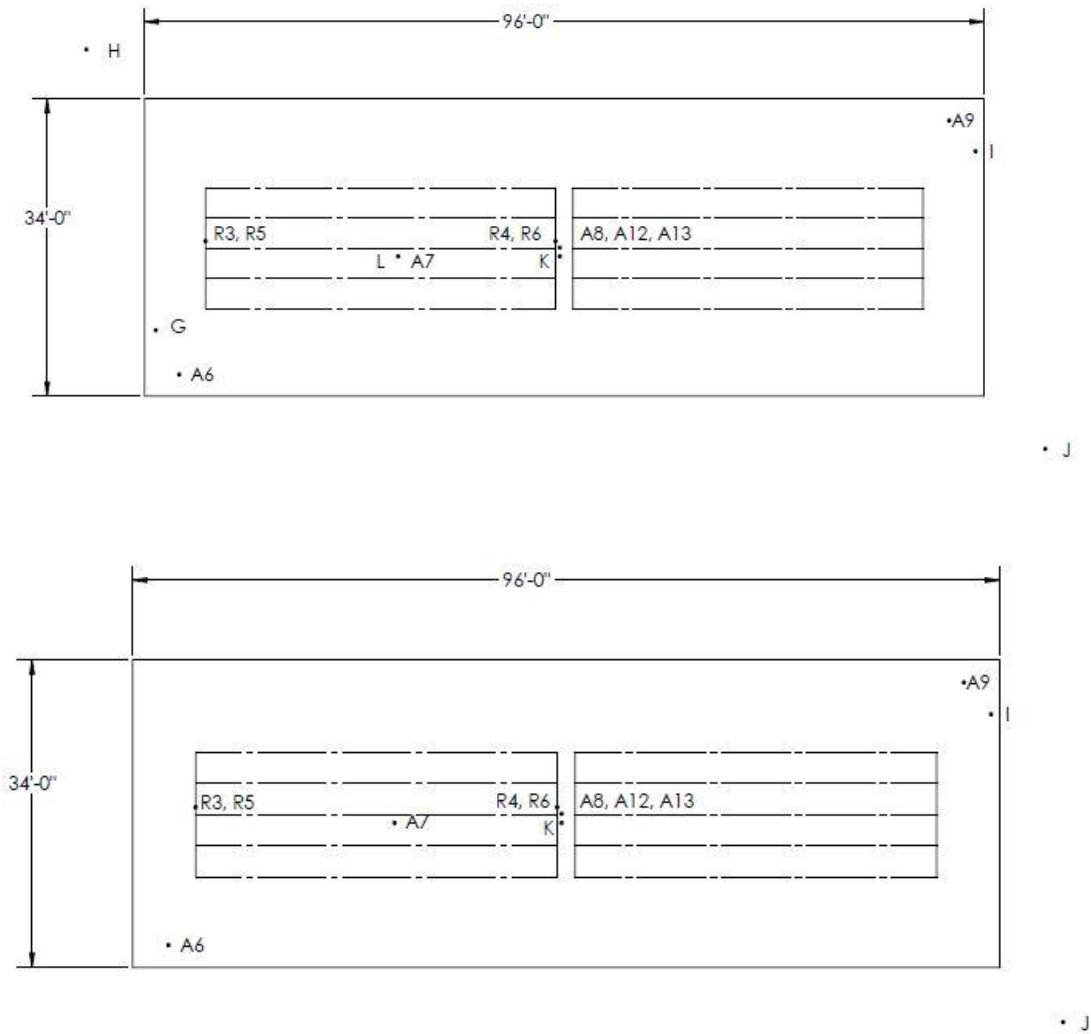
Blue House initial, top, and final, bottom, sensor layouts
